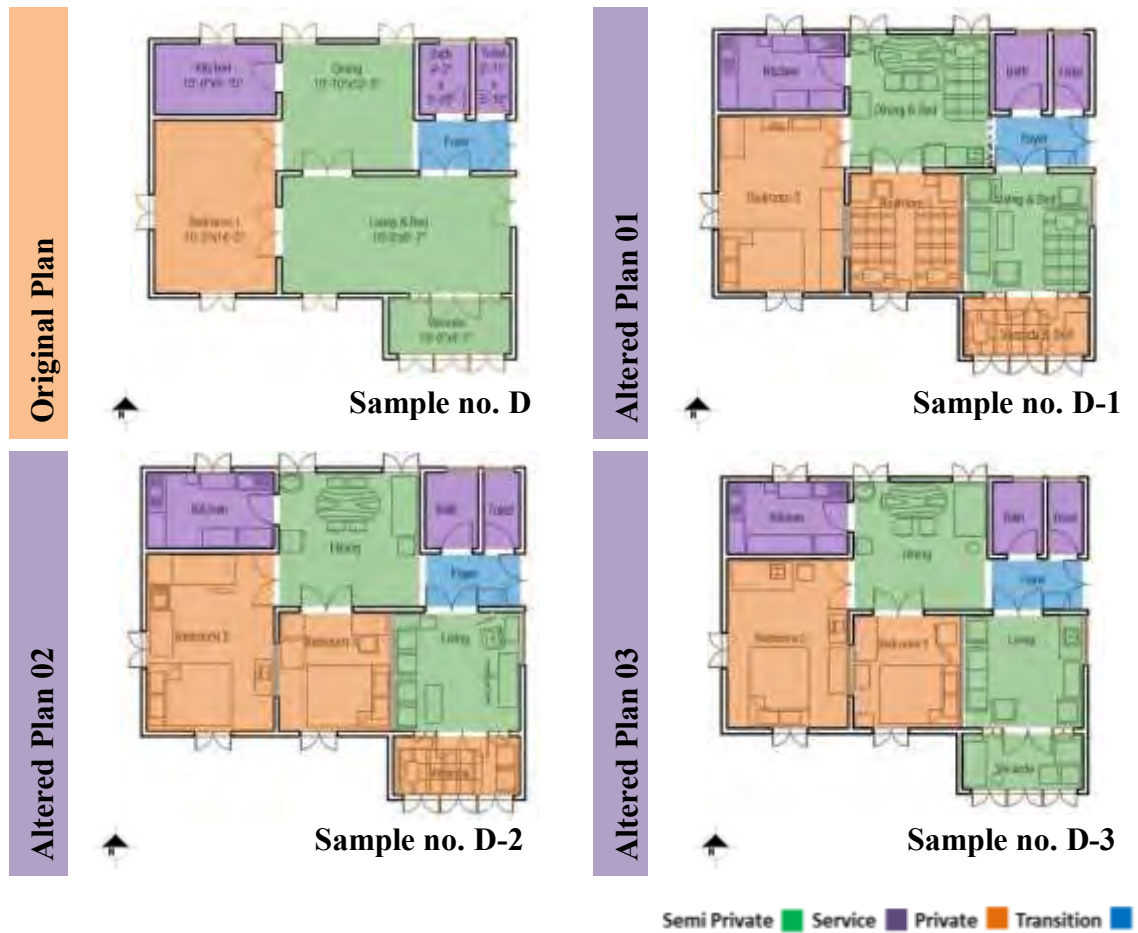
Group D; Plan of the case studies (Original and Altered)
